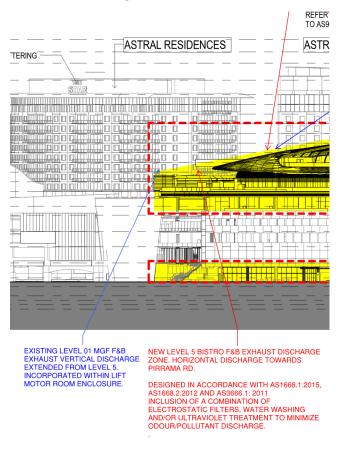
Level 06 Elevation view - Existing Level 01 MGF F&B and Level 05 Bistro exhaust discharge location.
